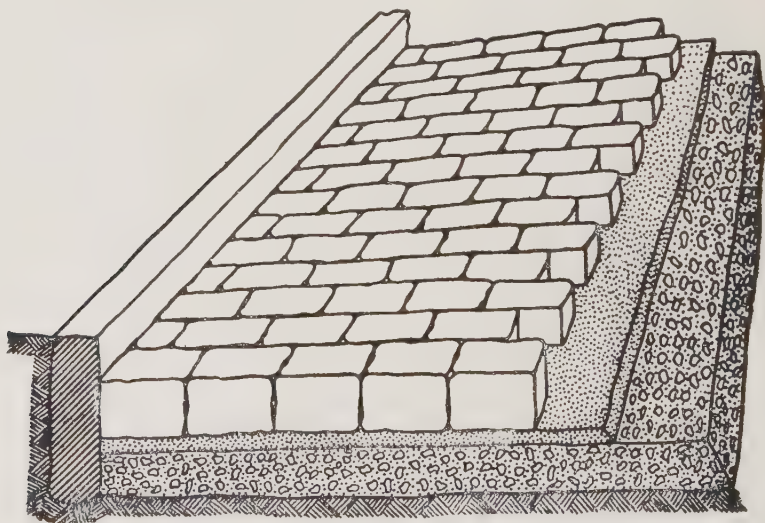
Section of stone-block pavement. By courtesy of I. O. Baker.
